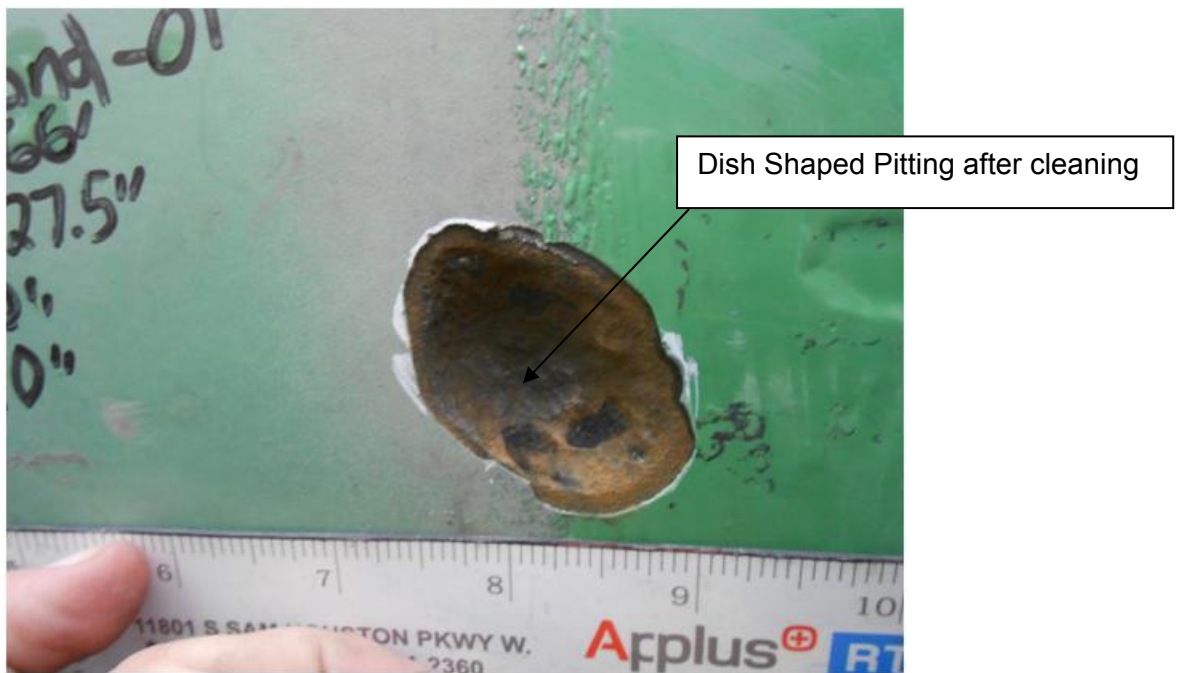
MP 995.95 –External Corrosion Pitting
